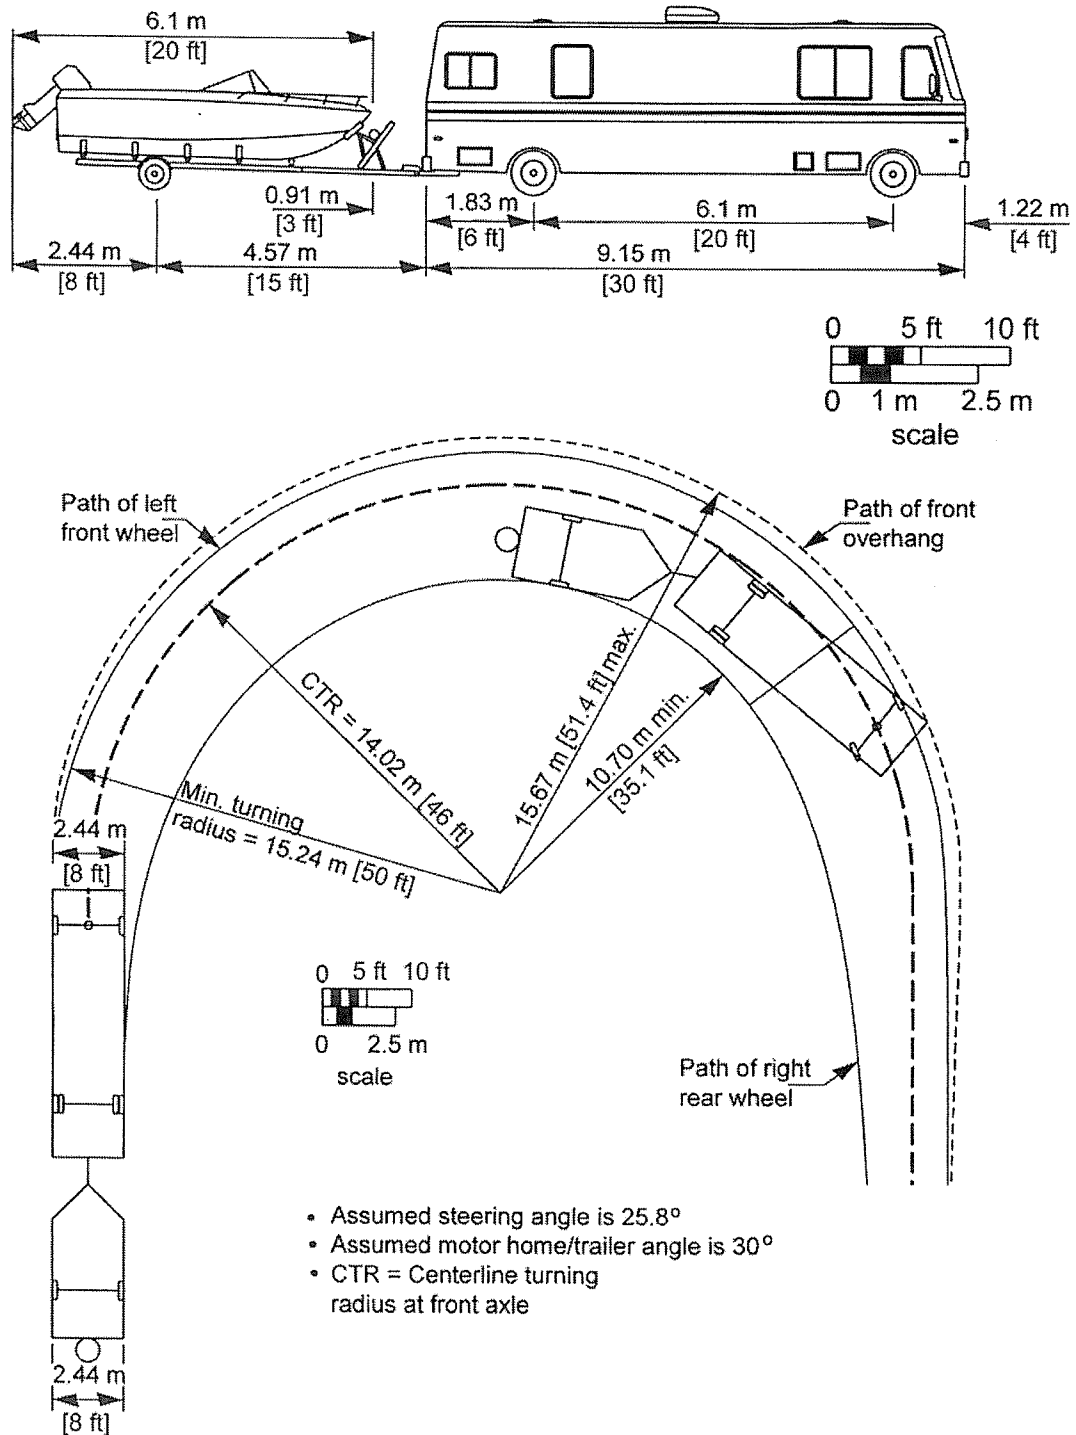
Minimum Turning Path for Motor Home and Boat Trailer (MH/B) Design Vehicle
